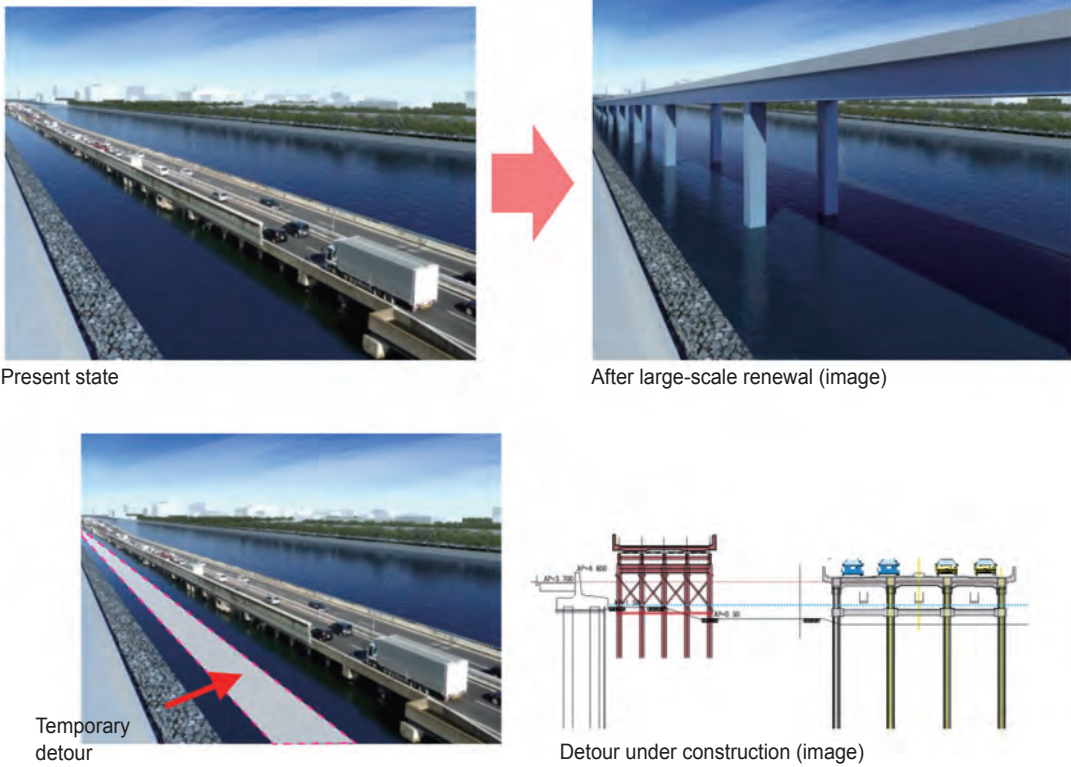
Image of Renewal of Higashi-Shinagawa~Samezu Landfill Section
